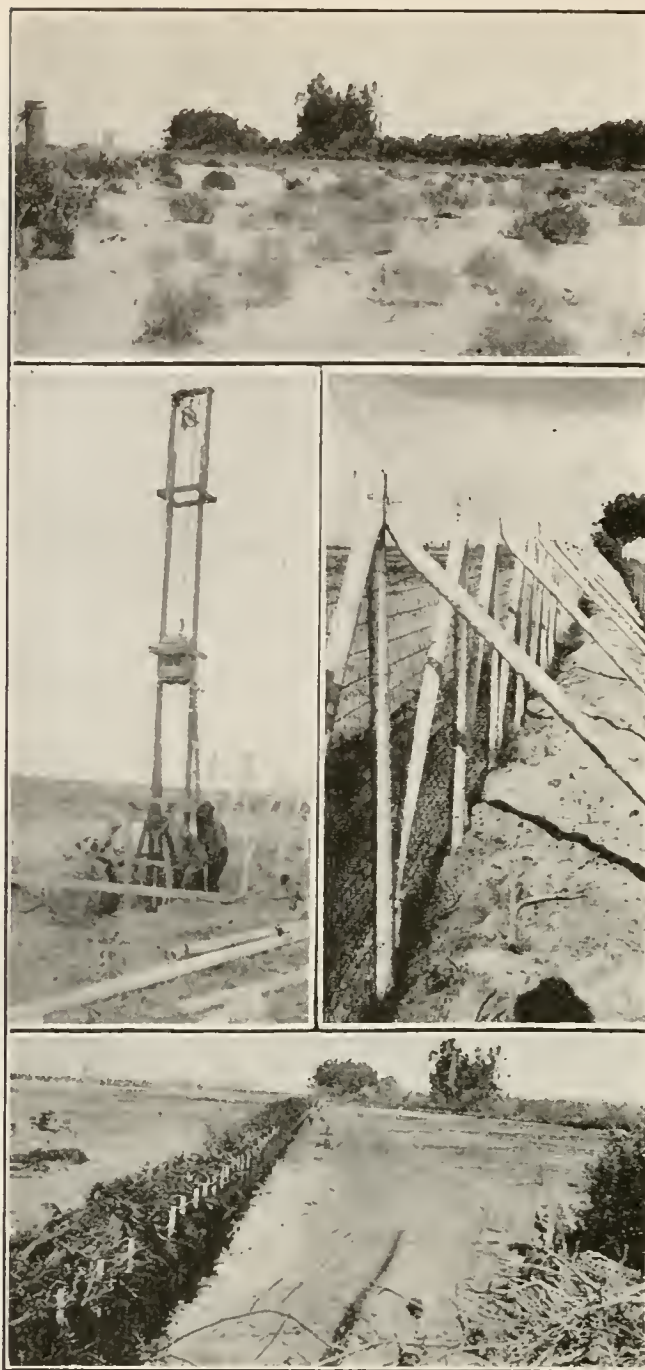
Top view shows bank destruction; center views, pile driver and fence; bottom view, completed revetment.
